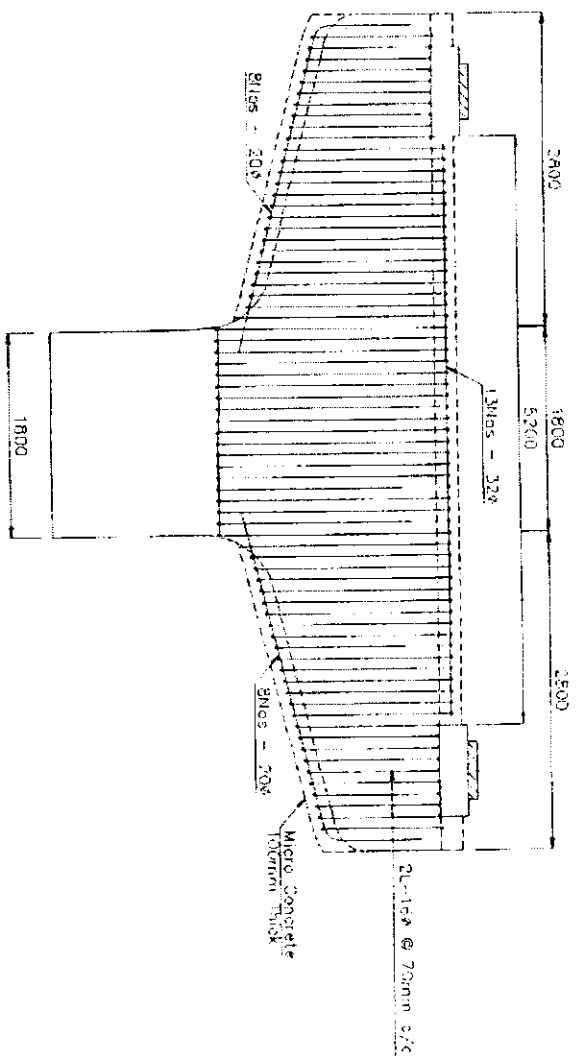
ADDITIONAL STEEL REINFORCEMENTS AT THE BOTTOM OF PIER CAP AND STIRRUPS
